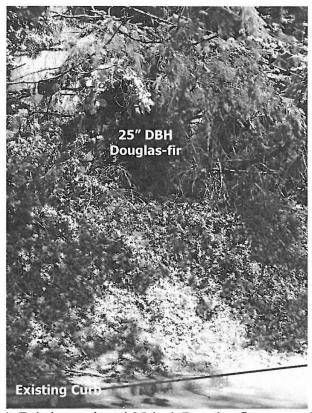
Existing curb and 25-inch Douglas-fir on top of slope.
